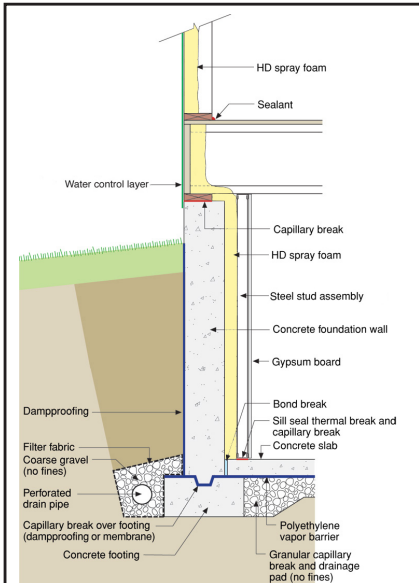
Spray foam insulation can be directly applied to the interior of concrete foundation walls.
